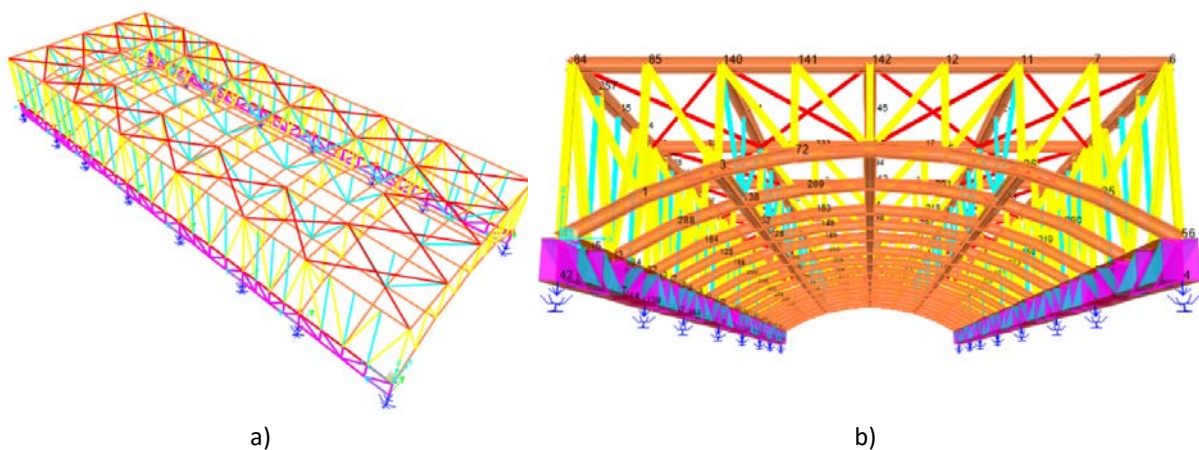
Finite Element Model (FEM) of the new roof's steel truss deck: a) numerical model and b) extrusion details.
